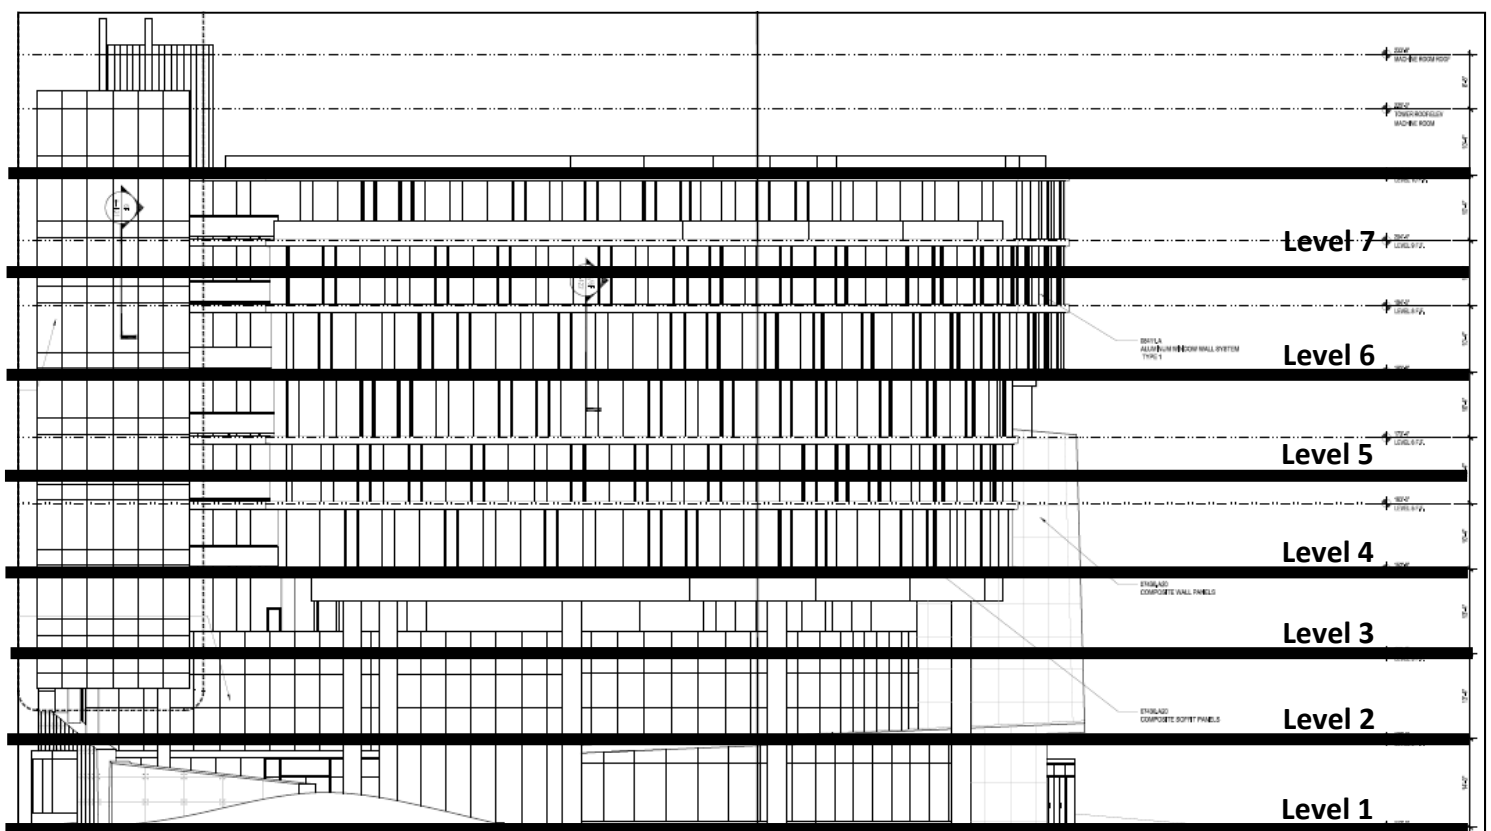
New level locations imposed on a building elevation. Courtesy of RTKL.
